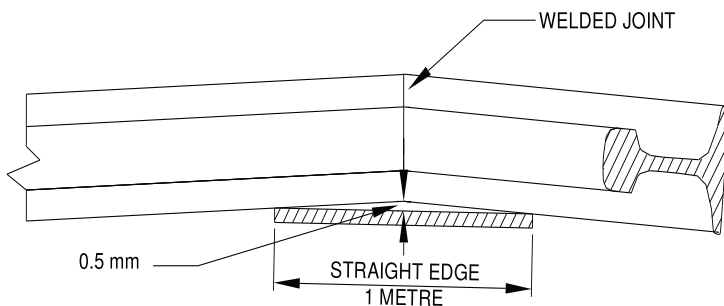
(b) Tolerance for Lateral Misalignment of Welded Joint
